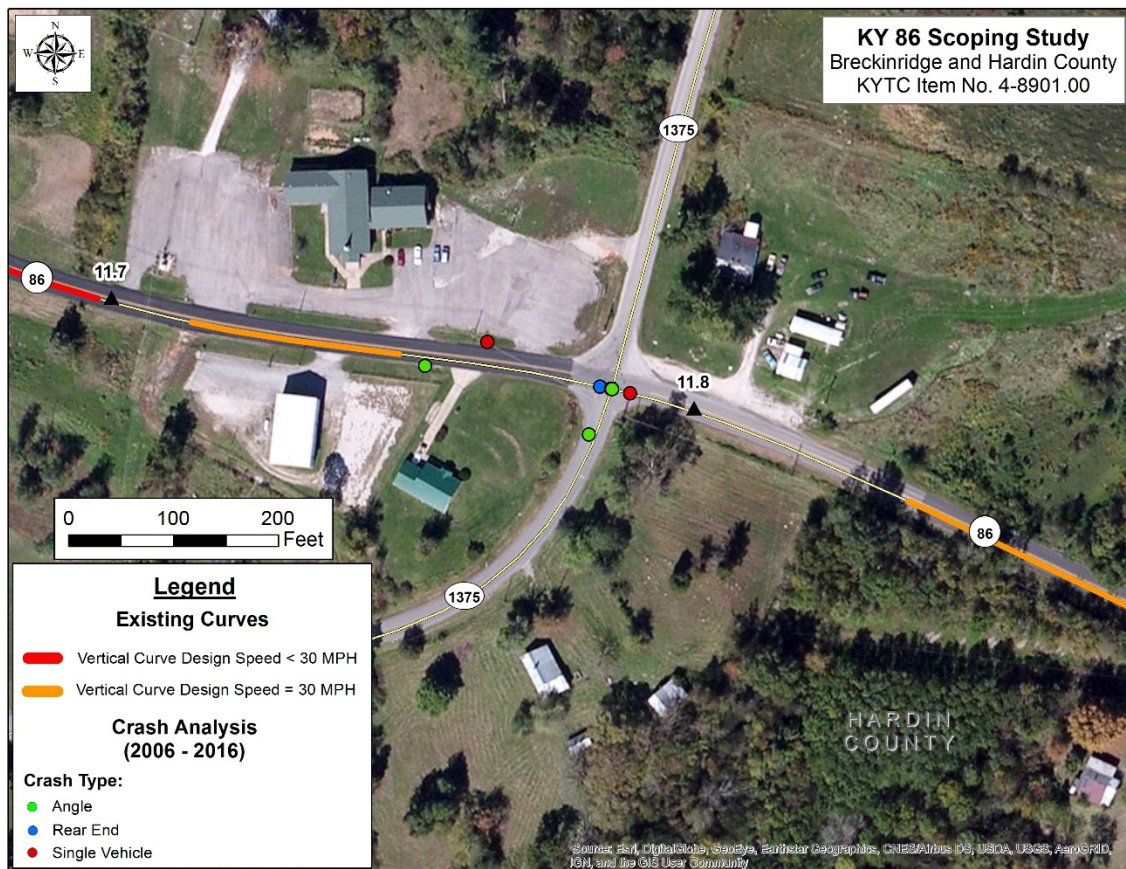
Spot Improvement 16 – KY 1375 Intersection
